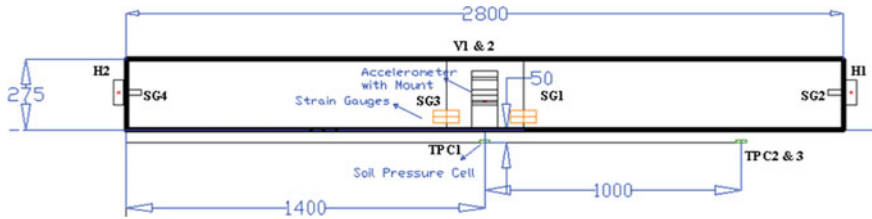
Instrumentation layout for Slab 2 (Front View)
